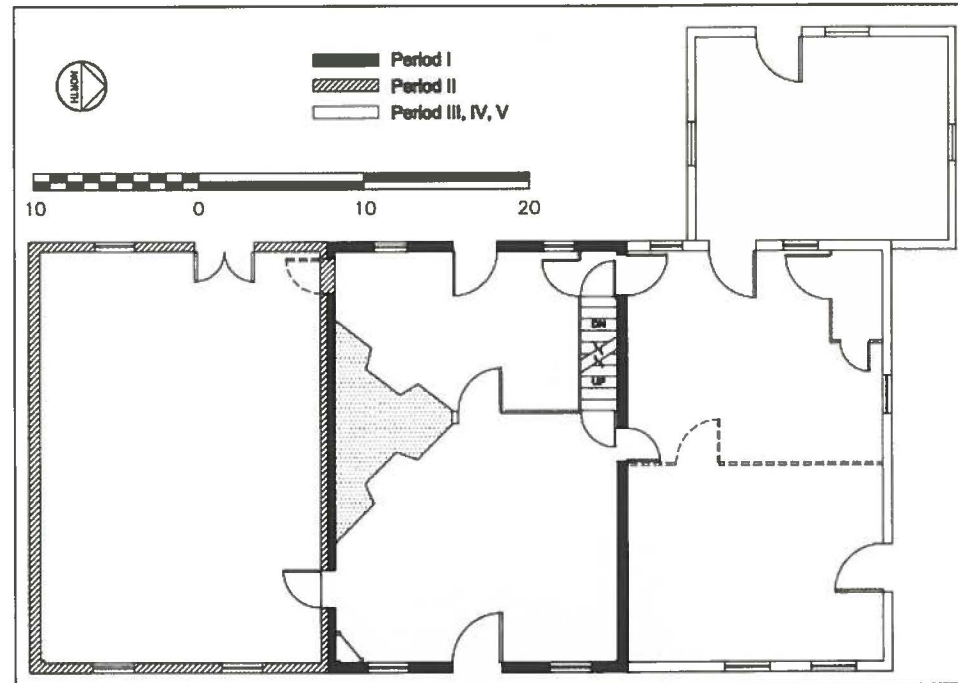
Shivers House First Floor Plan. The Middle Section Built 1742 Was a Double-Pile, Hall and Parlor Form with Corner Fireplaces.
